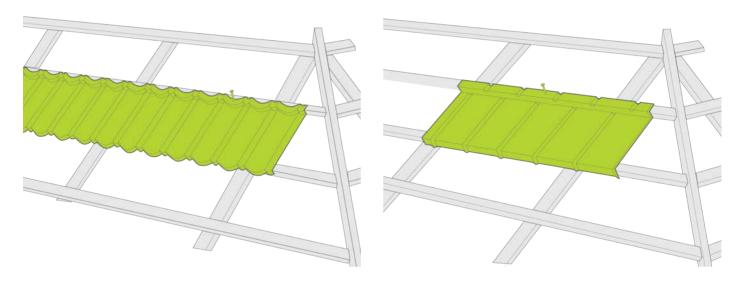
INSTALLING OF ROW 2 IN THE RIDGE AREA
